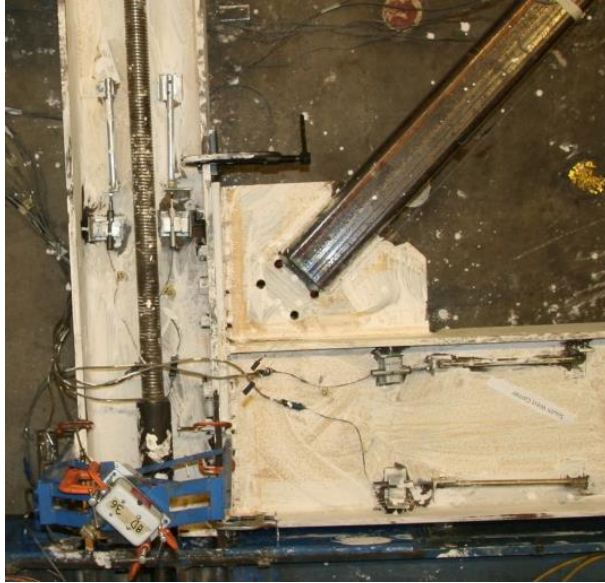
Specimen NCBF4-R1 Connection Detail
